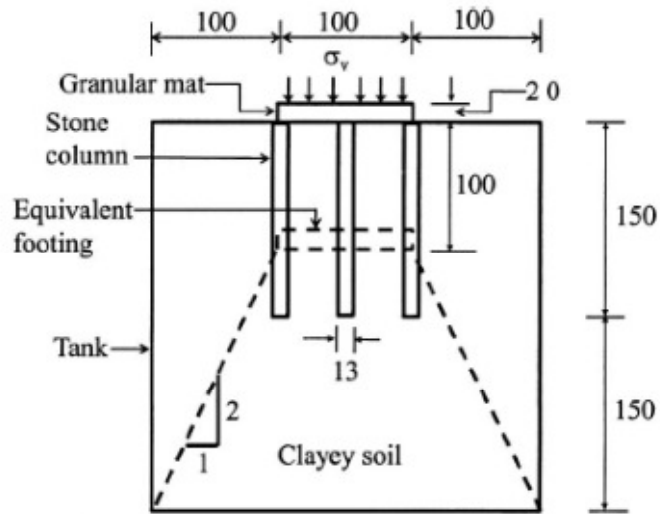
Schematic view of Stone column foundation (Shahu and Reddy, 2011)
